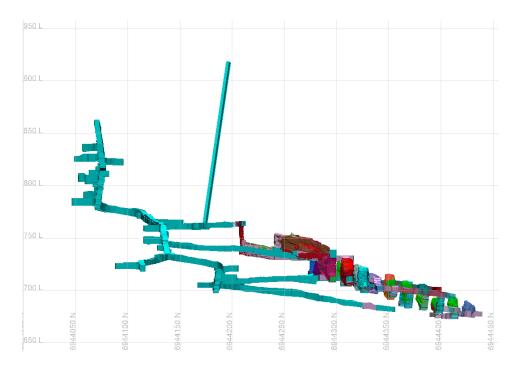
Area 118 Underground As-Built (Dec. 2015) Looking West
